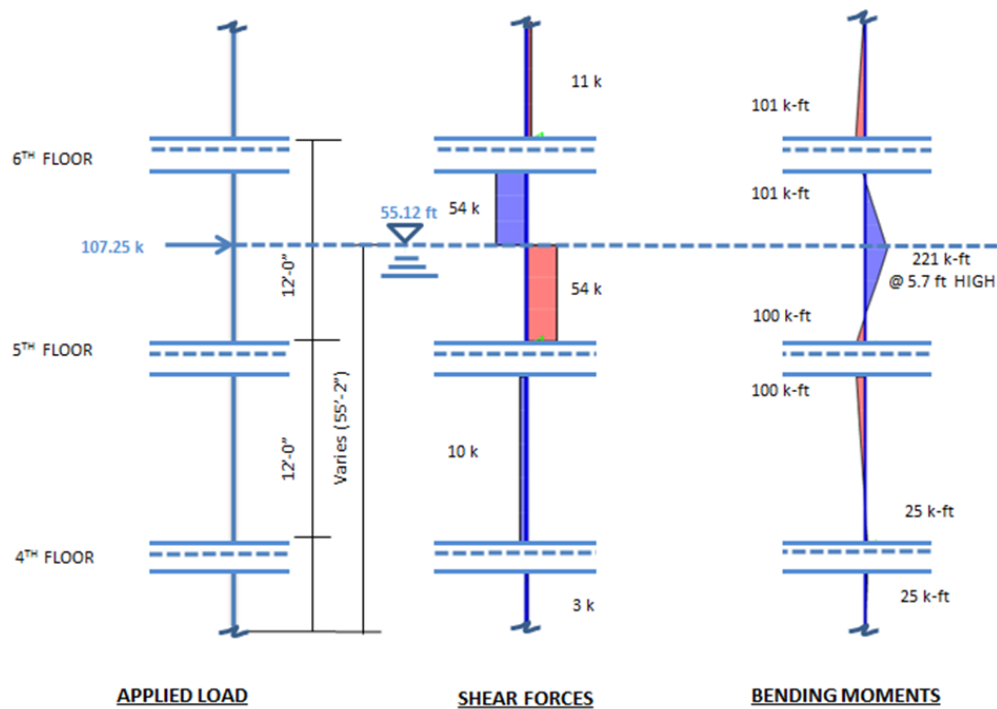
Impact load applied at max water height due to max water height being lower than mid height mid-height of assumed lateral restraint points at top and bottom of the 5th floor column
